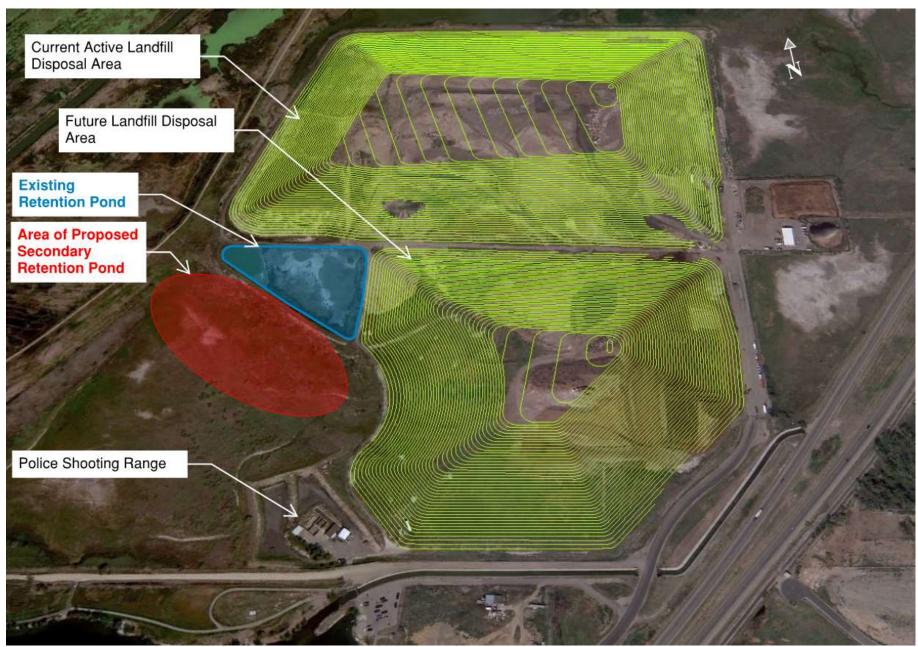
Bountiful Landfill Phase 3 Fill Plan with Proposed Pond Area
